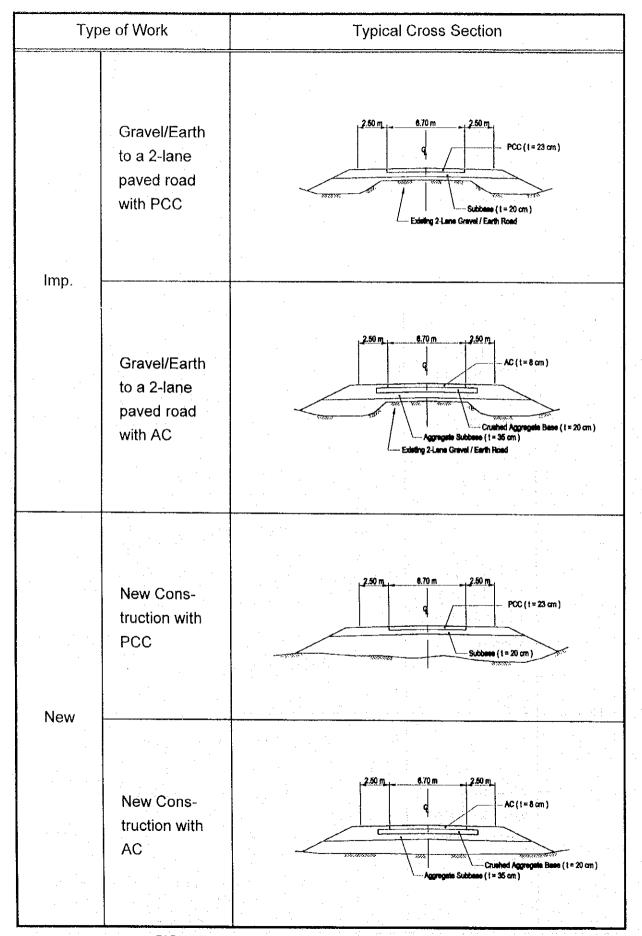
TYPICAL CROSS SECTIONS (1/4)
